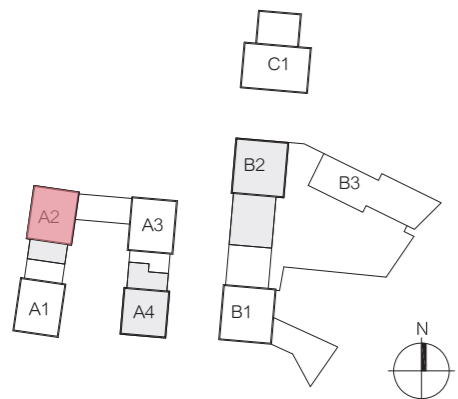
BUILDING A2 DESIGN ASSESSMENT
